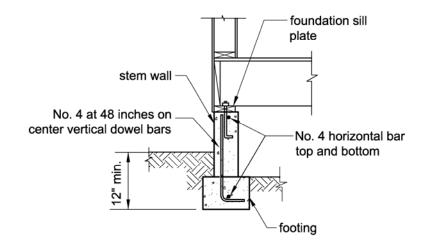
Perimeter foundation with separately placed footing and stem wall.
